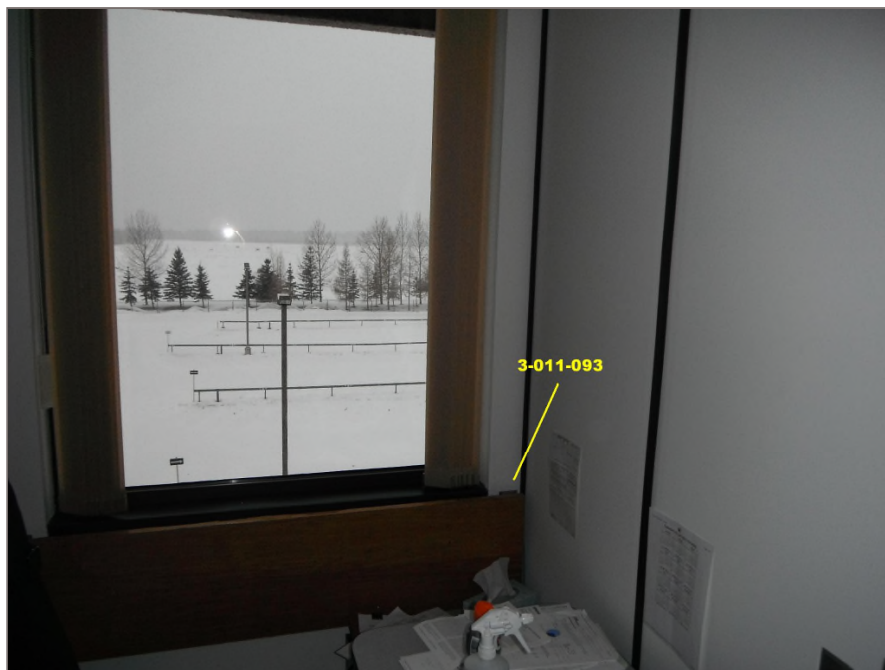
Asbestos-containing drywall joint compound applied to the office perimeter wall on the second floor. Tetra Tech sample 3-011-093.
